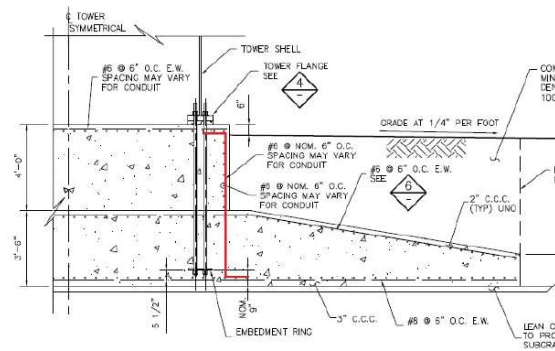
Pre-2010 Foundation design with minimal vertical reinforcement.
